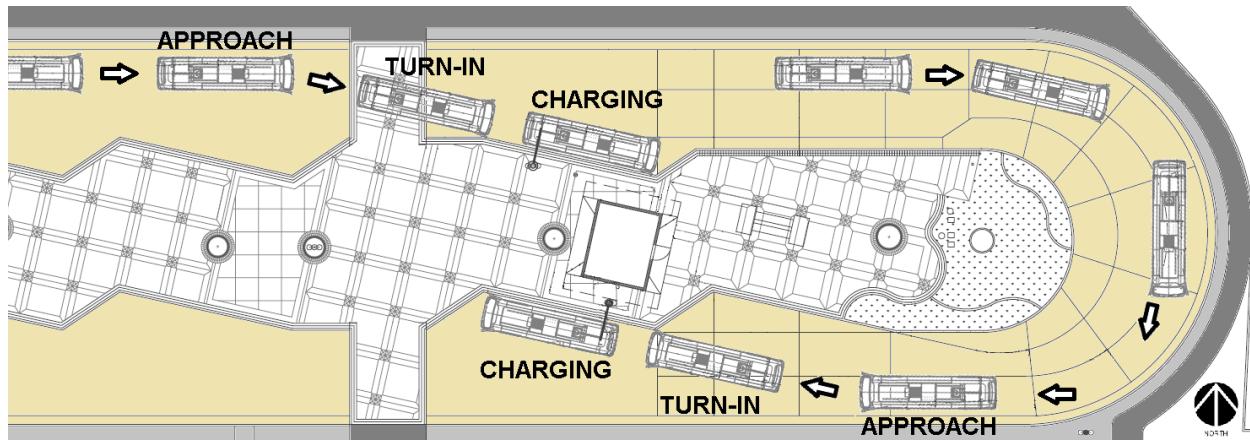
One-Stall and Two-Stall Transit On-Route Charge Site
